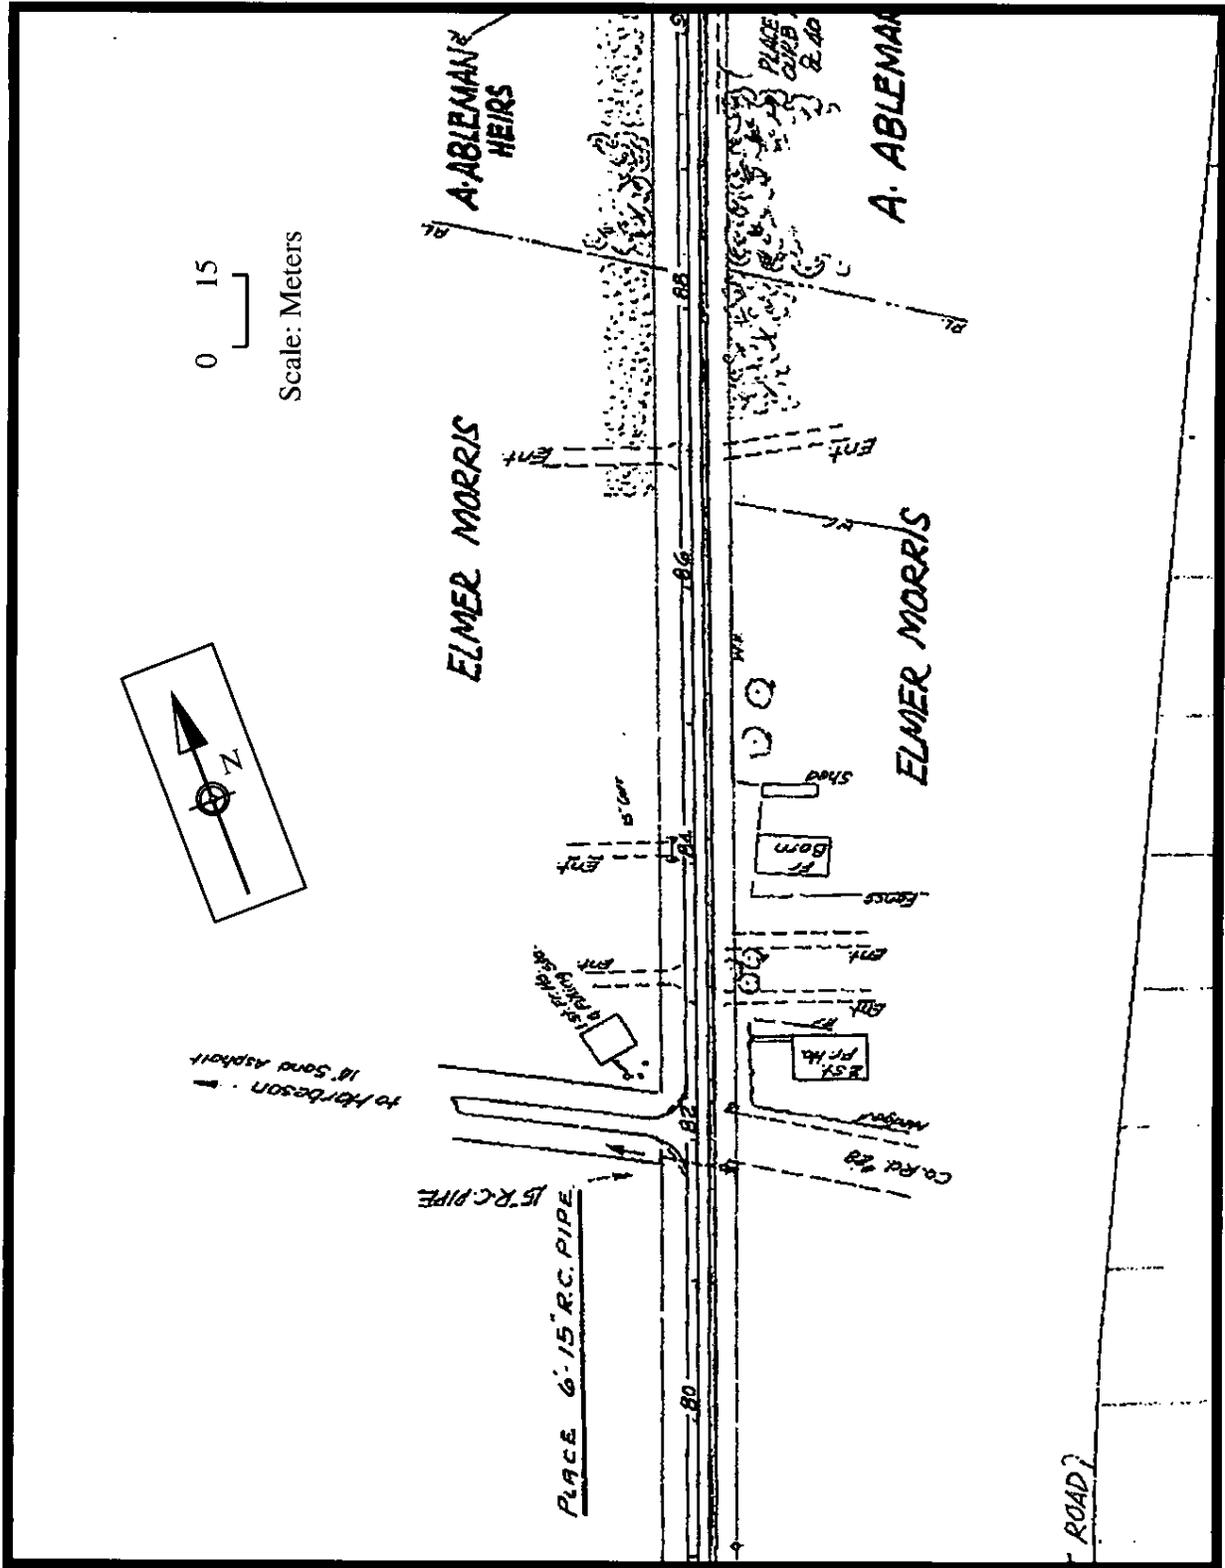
As Builts of State Road 24/State Road 5 Intersection in 1939
